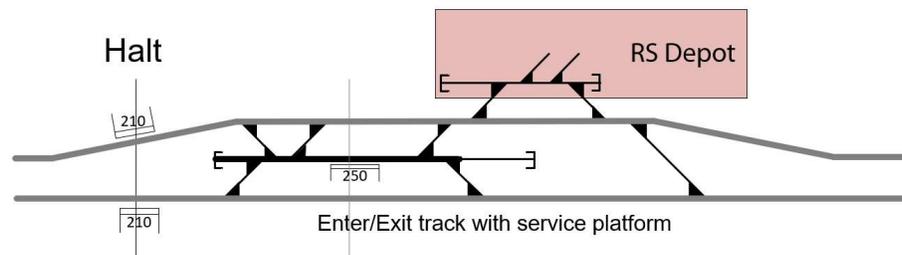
Example of private siding with specialized Entry/Exit track for rolling stock depot
